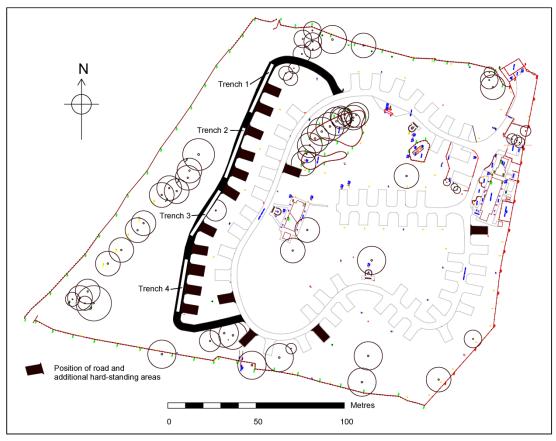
Trench Location plan showing the caravan site and areas of proposed development (shaded black).
